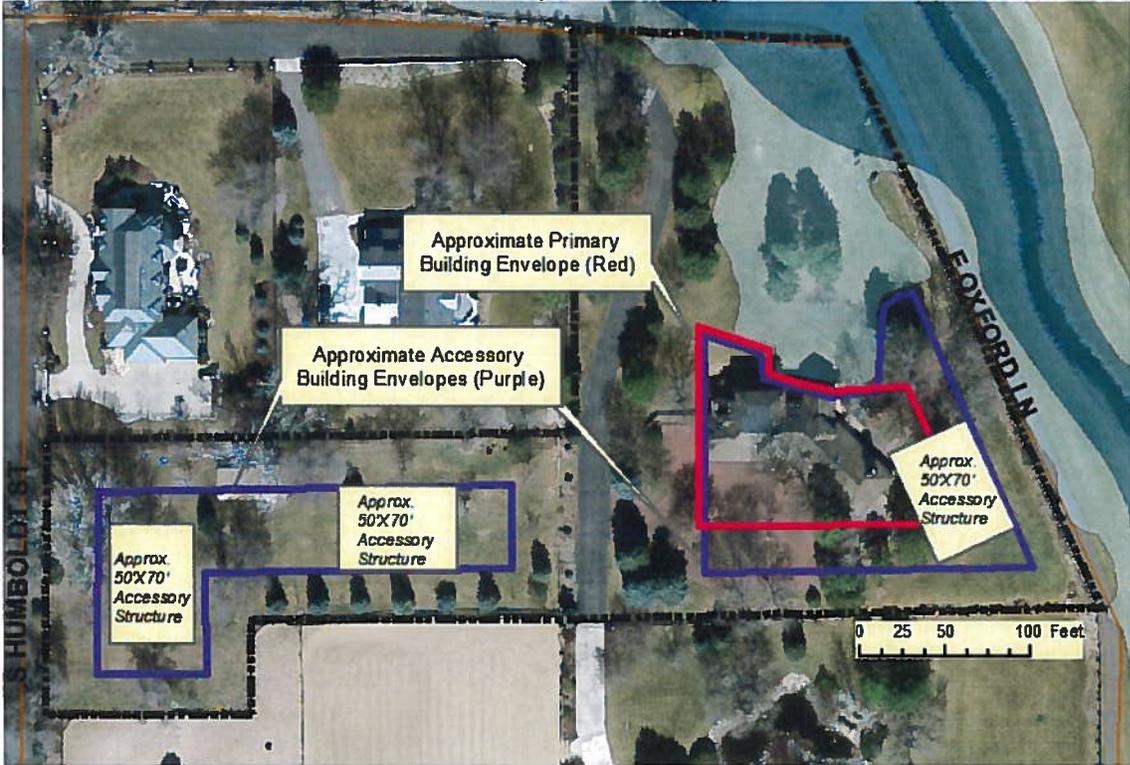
Example Locations of Typical Accessory Structure Footprint Outside of SFHA
